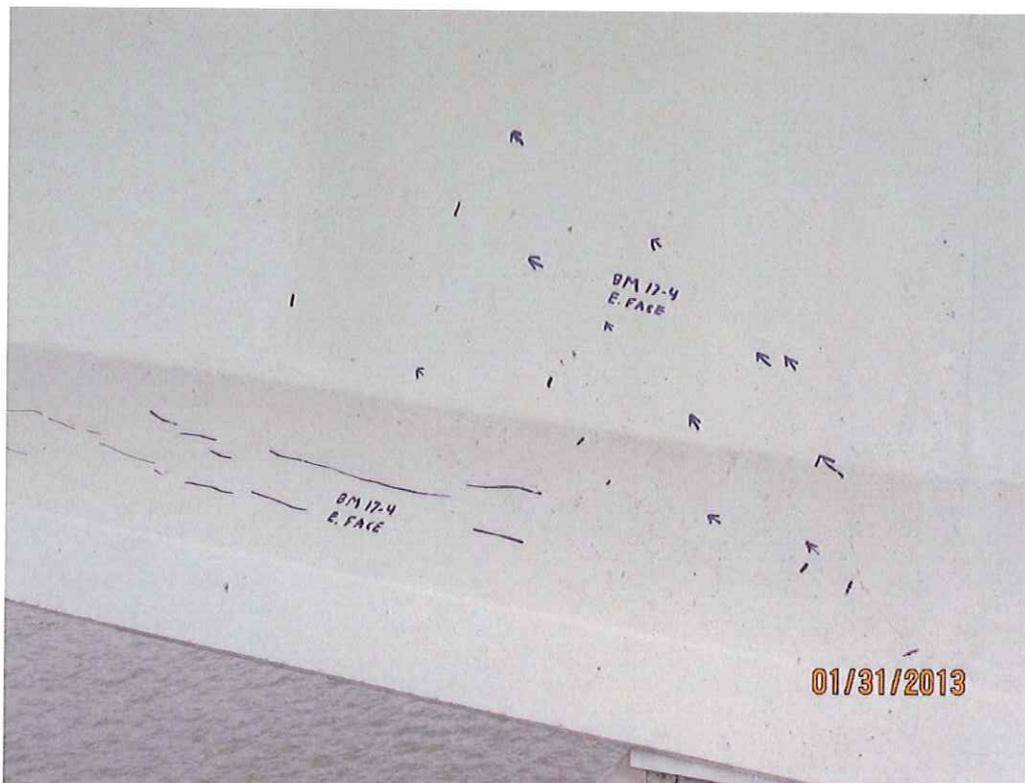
Typical diagonal crack in beam web and horizontal cracks in bottom flange
